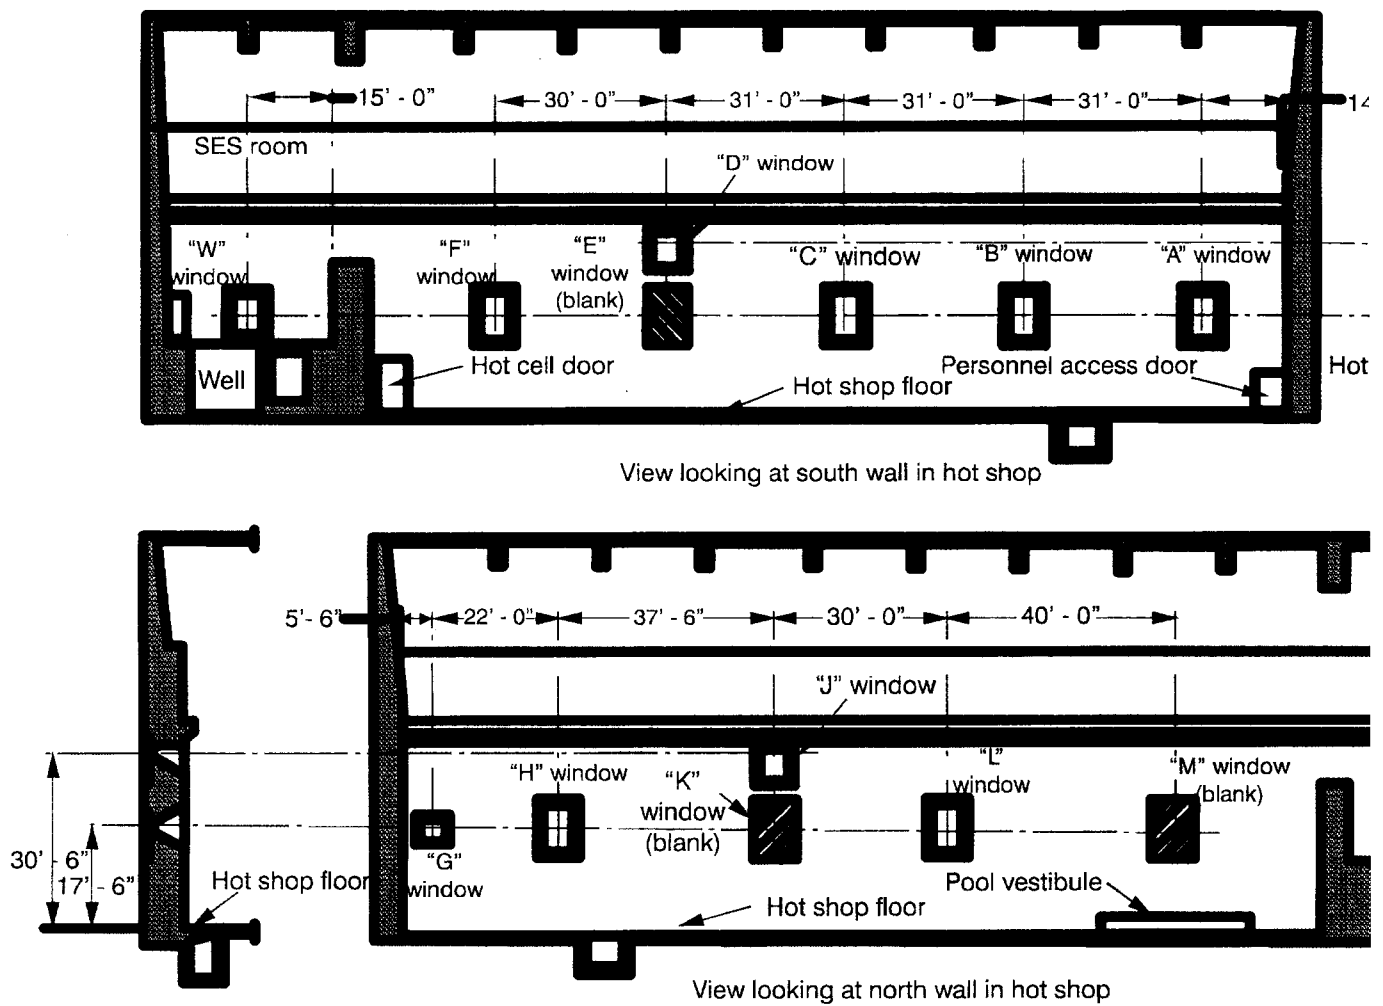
Elevation view of the TAN Shot Shop shielding windows.
